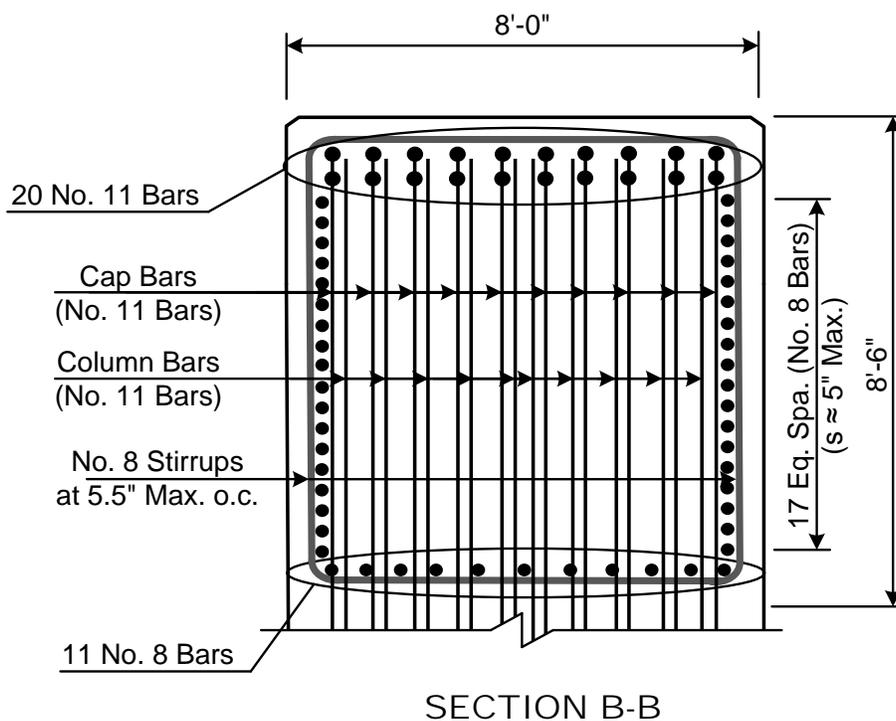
Section B-B Showing Reinforcement Details (Based on STM Specifications)
